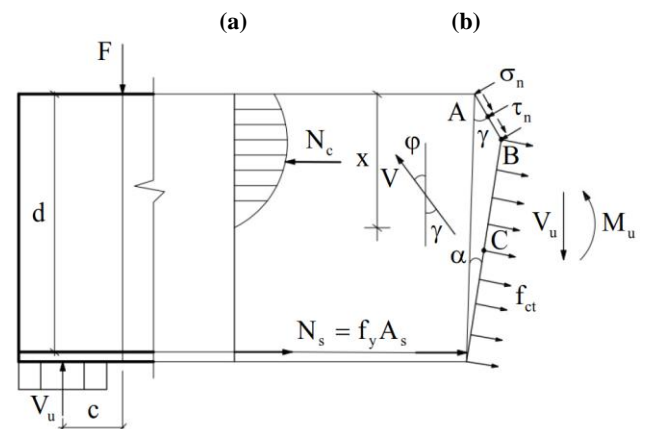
For setting the failure boundary of a reinforced concrete element by concrete fragmentation in the compressed zone at reinforcement yielding (a) and at shear (b).
